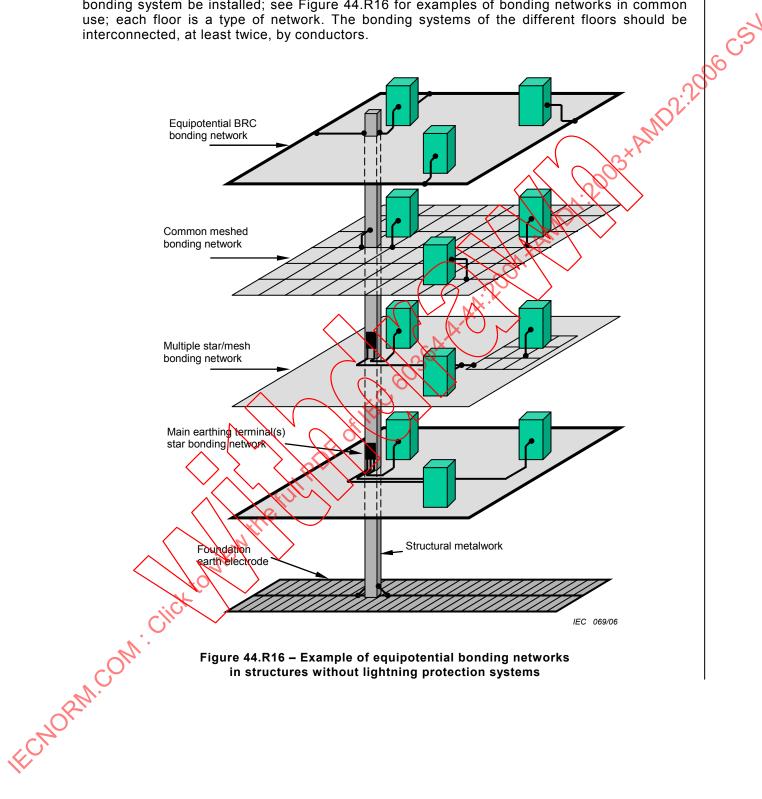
R16 - Example of equipotential bonding networks in structures without lightning protection systems
